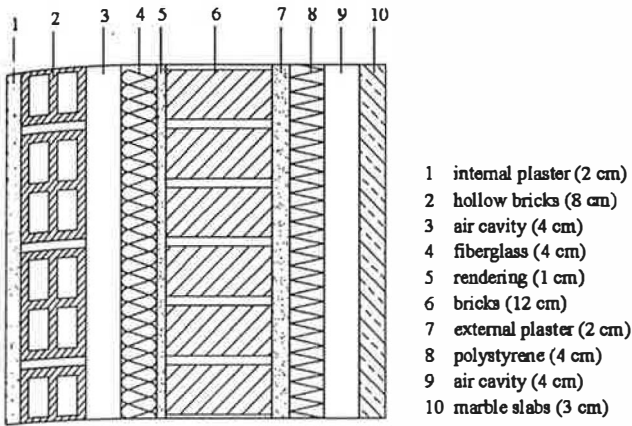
Application of a ventilated envelope on the wall of Figure 2.
